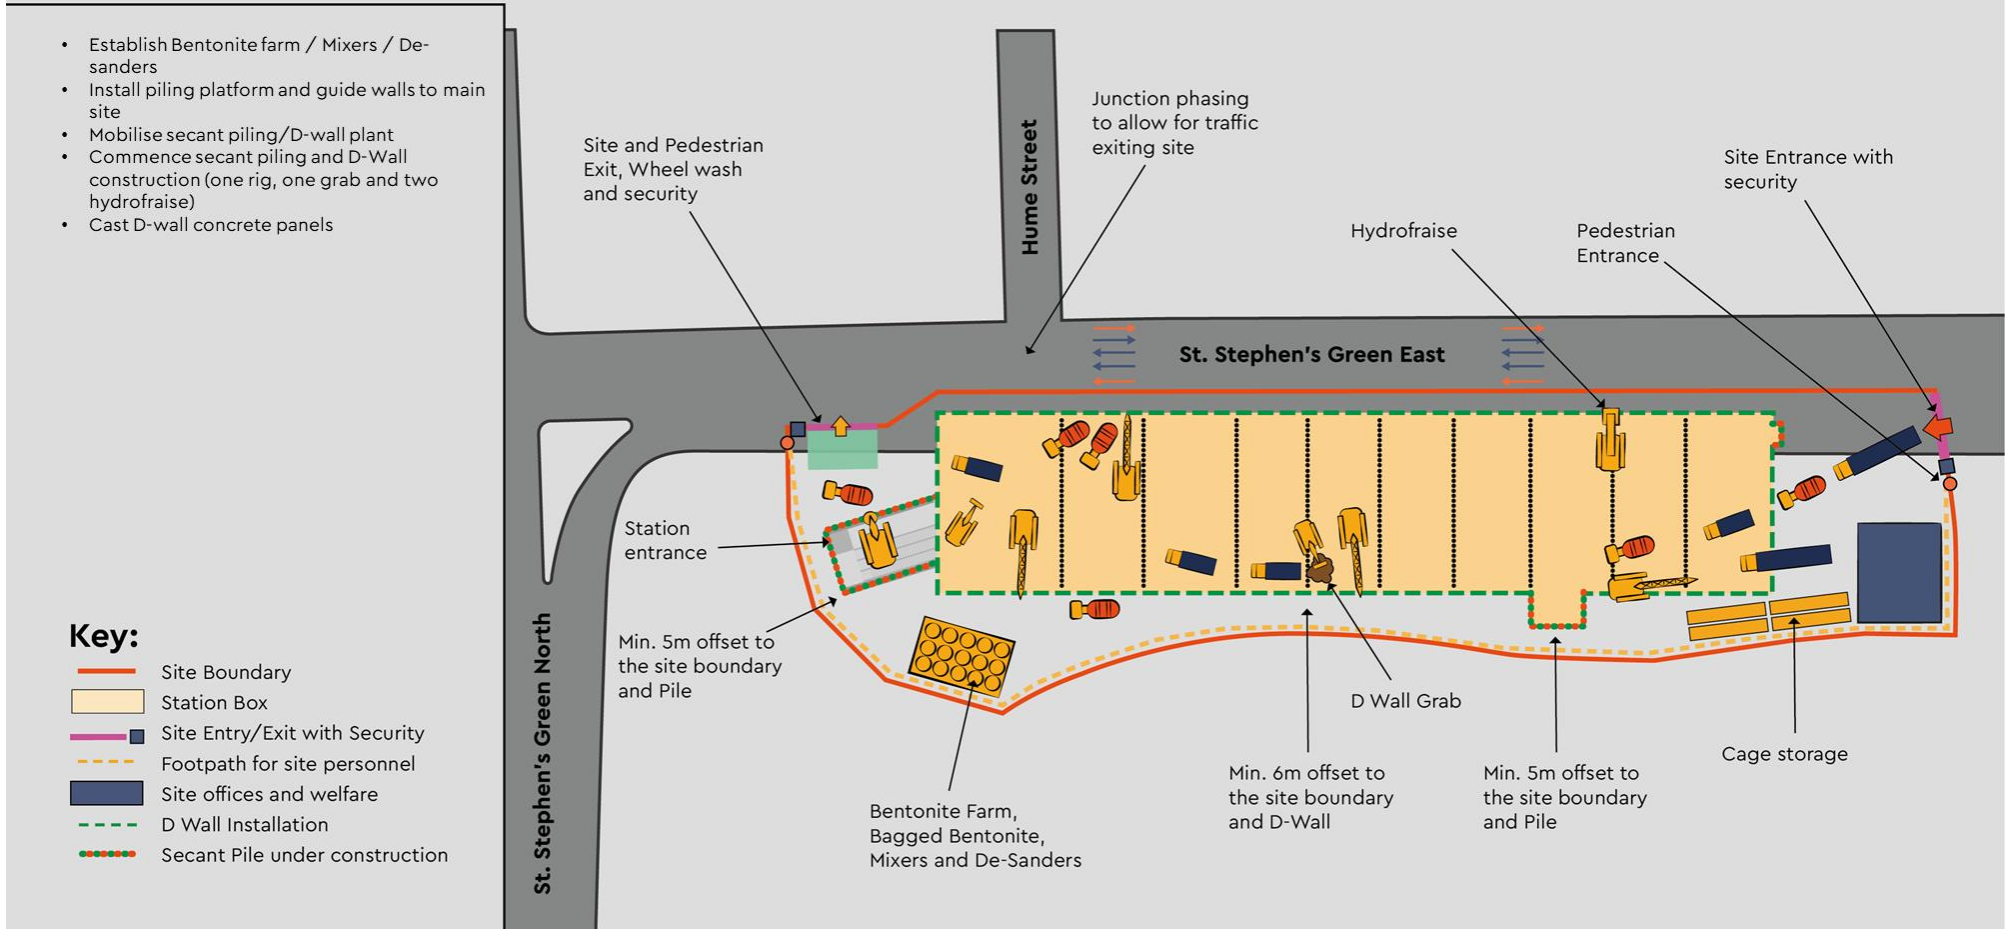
St Stephen's Green Stage 2 – Diaphragm wall & piling works
